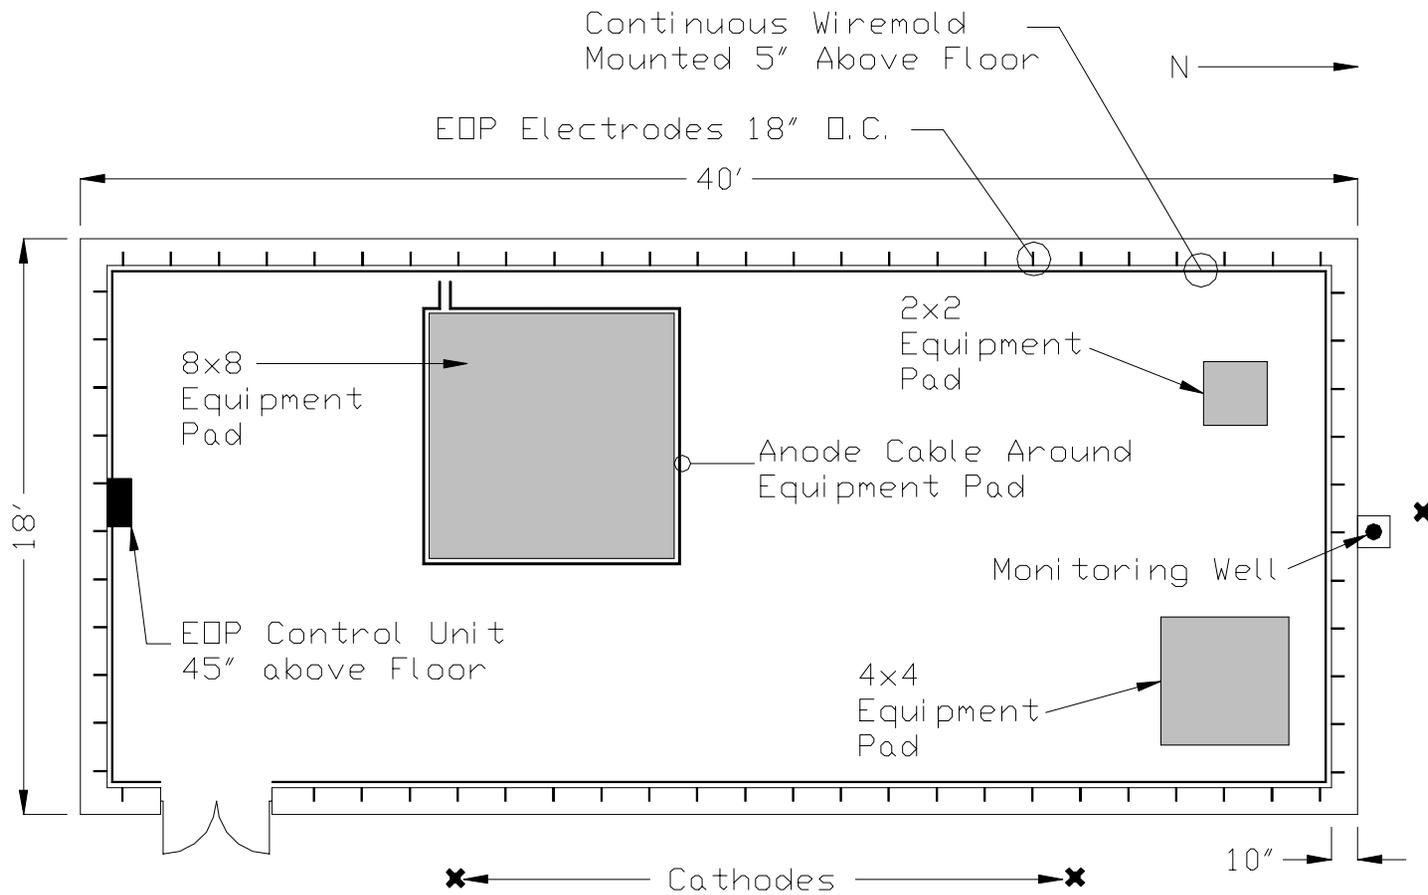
Layout of EOP installation at Ft. Jackson.
